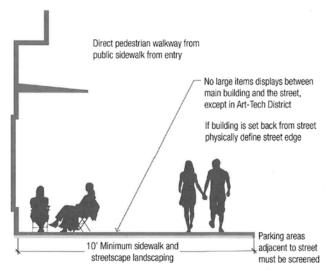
E.1: Requirements for development adjacent to Type C Streets (this diagram is for illustrative purposes only. See section 18.120.220.E for applicable requirements).
